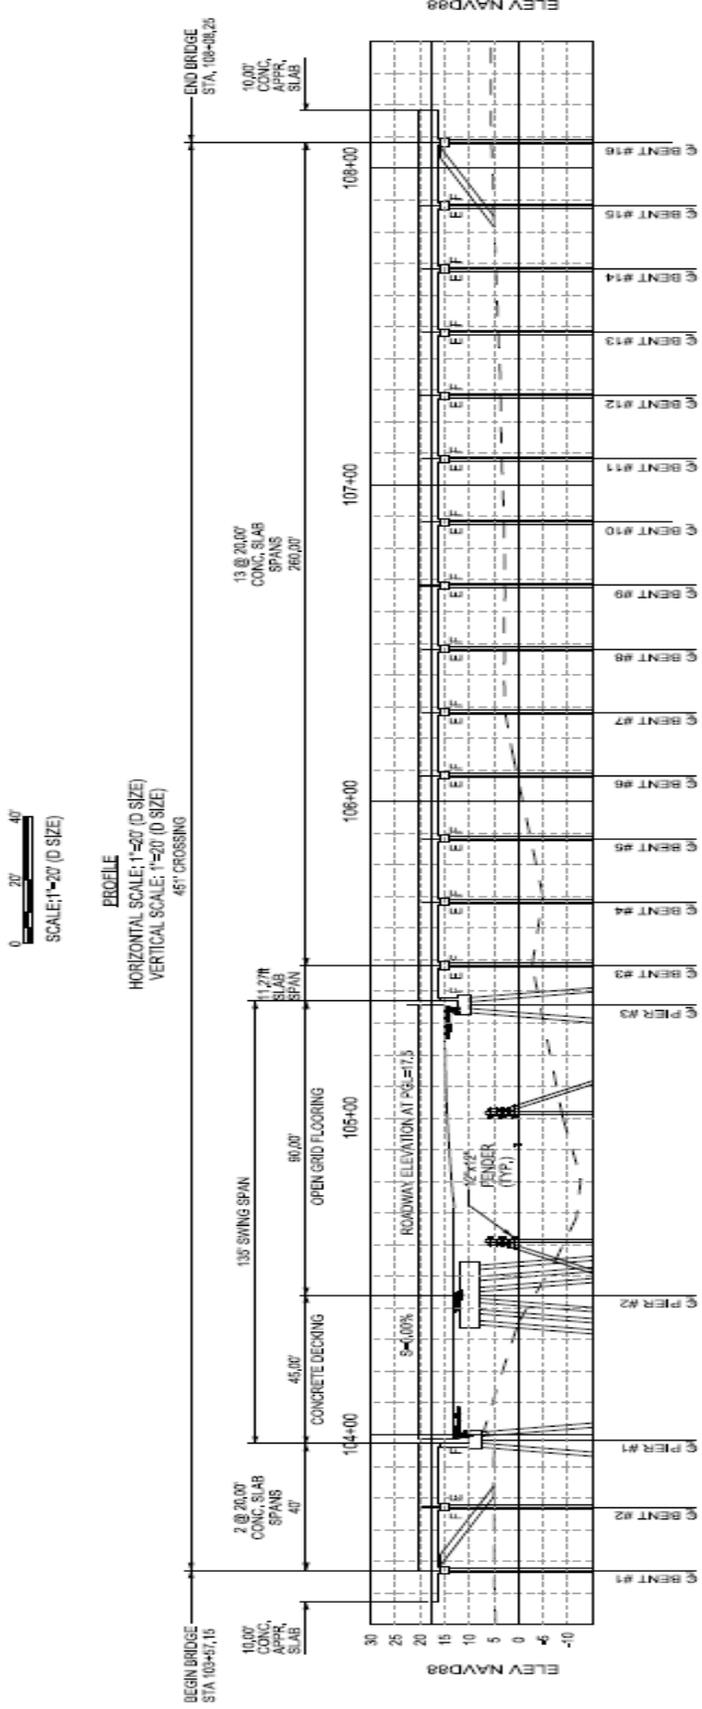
Proposed Bayou Bienvenue profile, pivot pier installed on north bank would be within 0-6 ft of water. Dotted line depicts average water depths.
